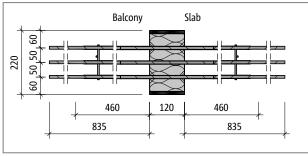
Schöck Isokorb® XT type B: Product plan view
